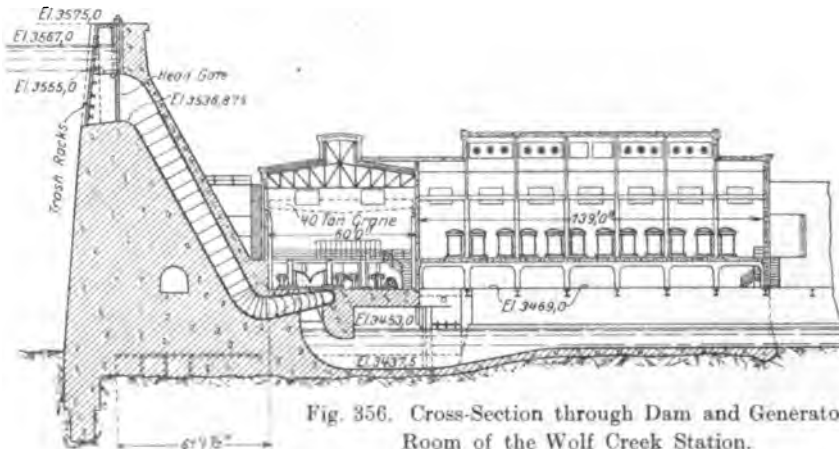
Cross-Section through Dam and Generator Room of the Wolf Creek Station.
